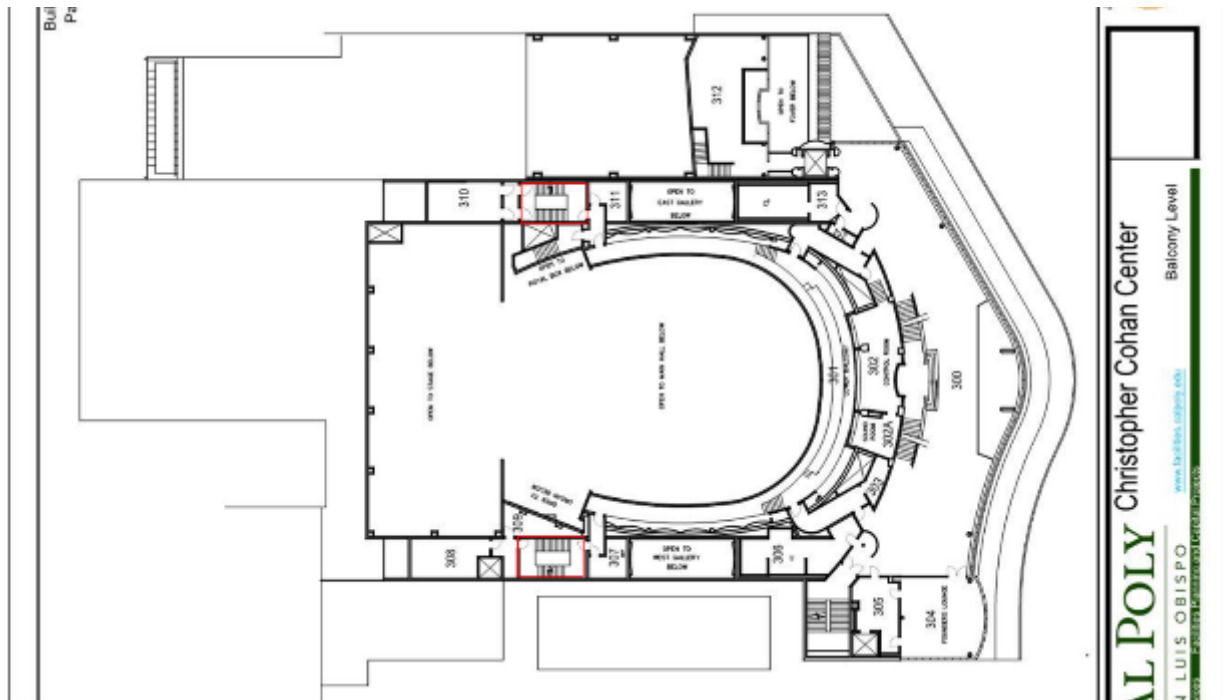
Balcony level plan showing the location of enclosed exits stairs connected directly to the balcony and gallery level.
